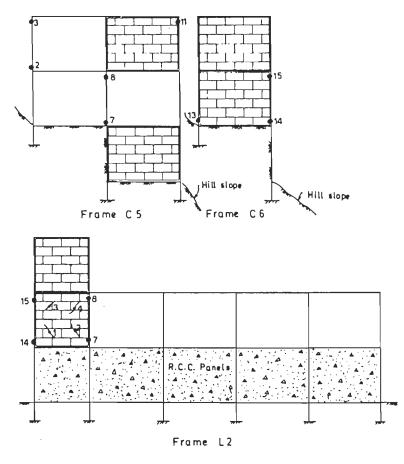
Location of Plastic Hinges and Cracks in Masonry Infills
